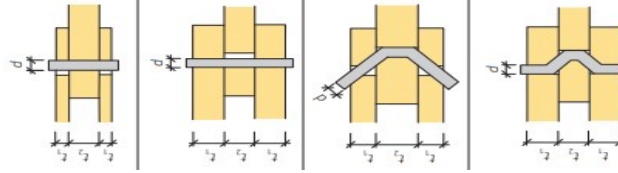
Failure modes for a timber connection in double shear (Svenskt trä, 2016)
